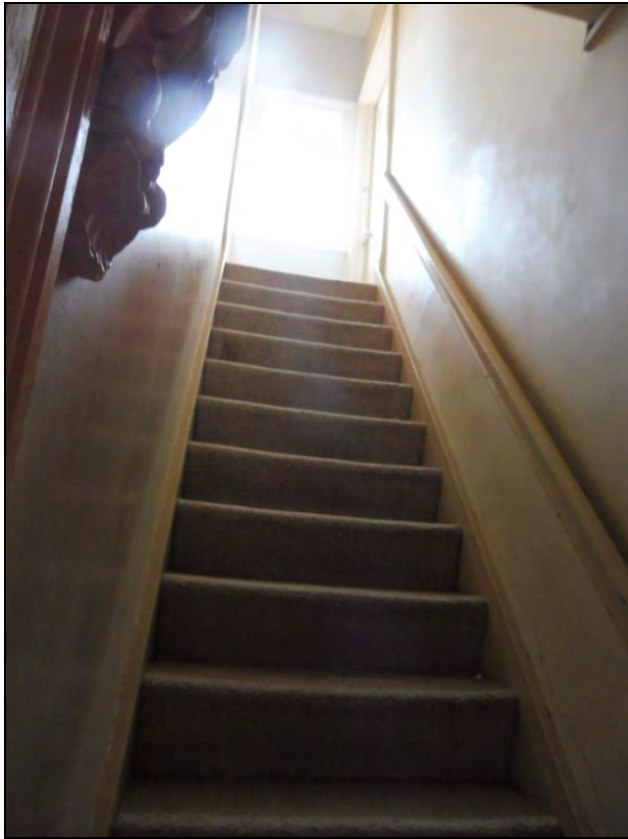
The interior of No. 14 retains typical layout with two rooms on the ground and first floor accessed by a side corridor running along the central party wall.
